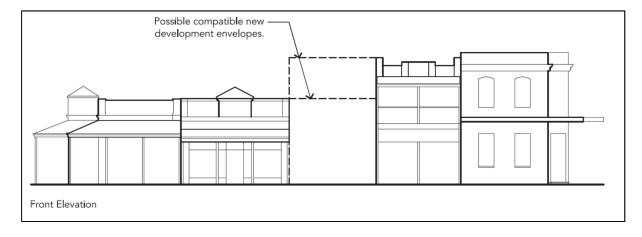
Street elevation illustrating compatible building envelope. Griffiths Architects 2015
